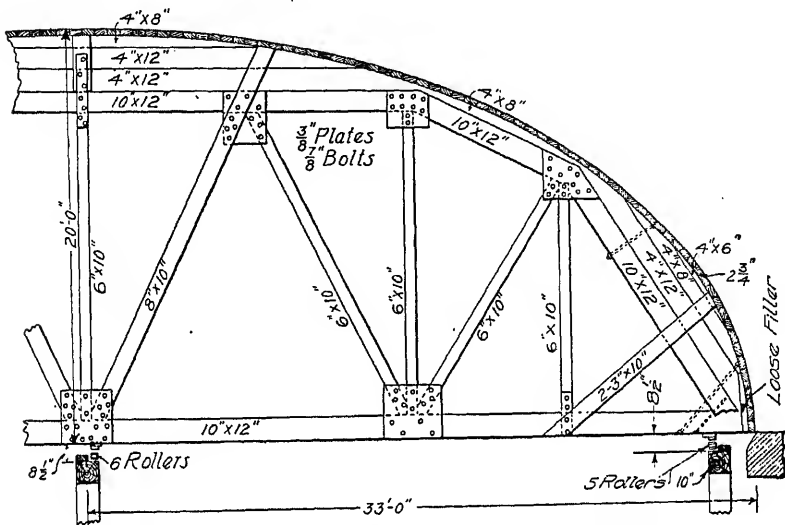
Typical Arch Form Used at 175th Street, New York City
